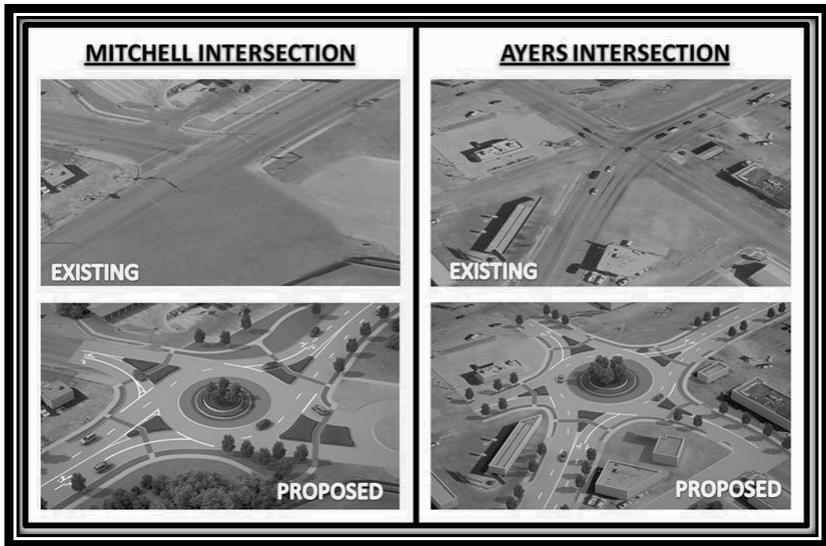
Existing Conditions and Proposed Roundabouts at the Mitchell and Ayers Intersections.
